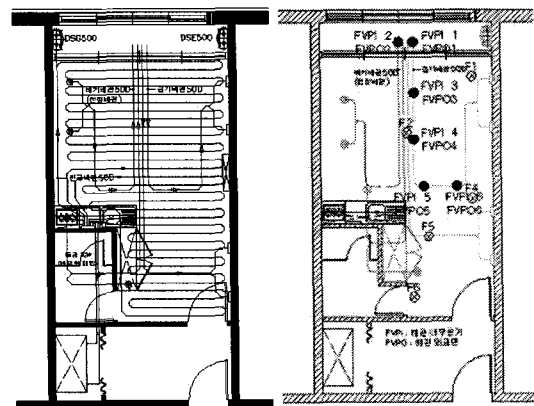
Piping & Duct Plan Fig. 2 Measuring Points
